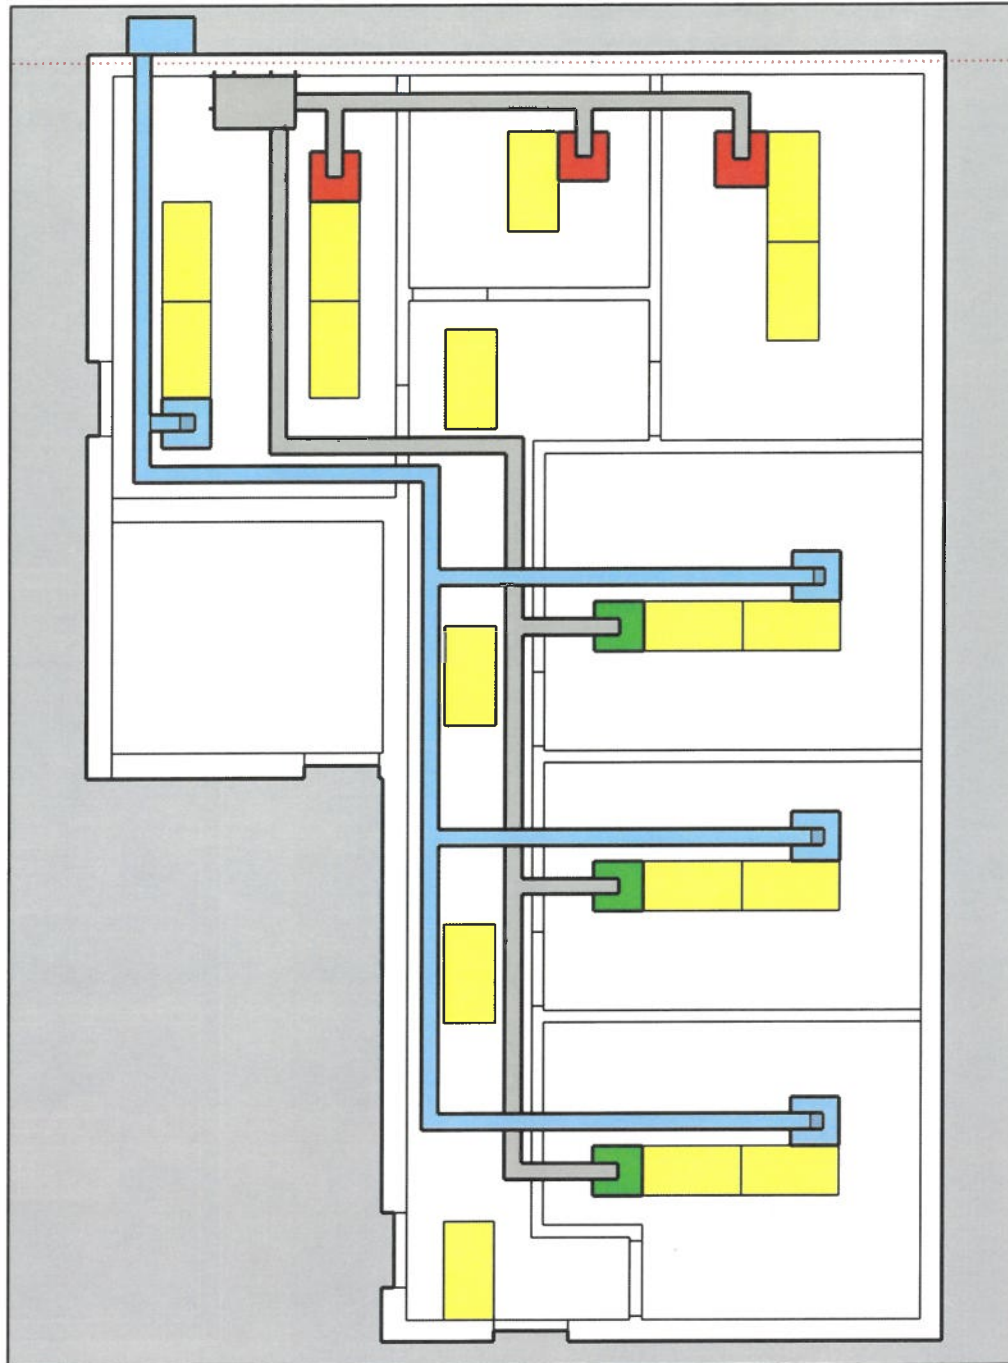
Recommended layout for HRV and Heat Pump ducts above office suite of Building 502 (Top-Down View).
